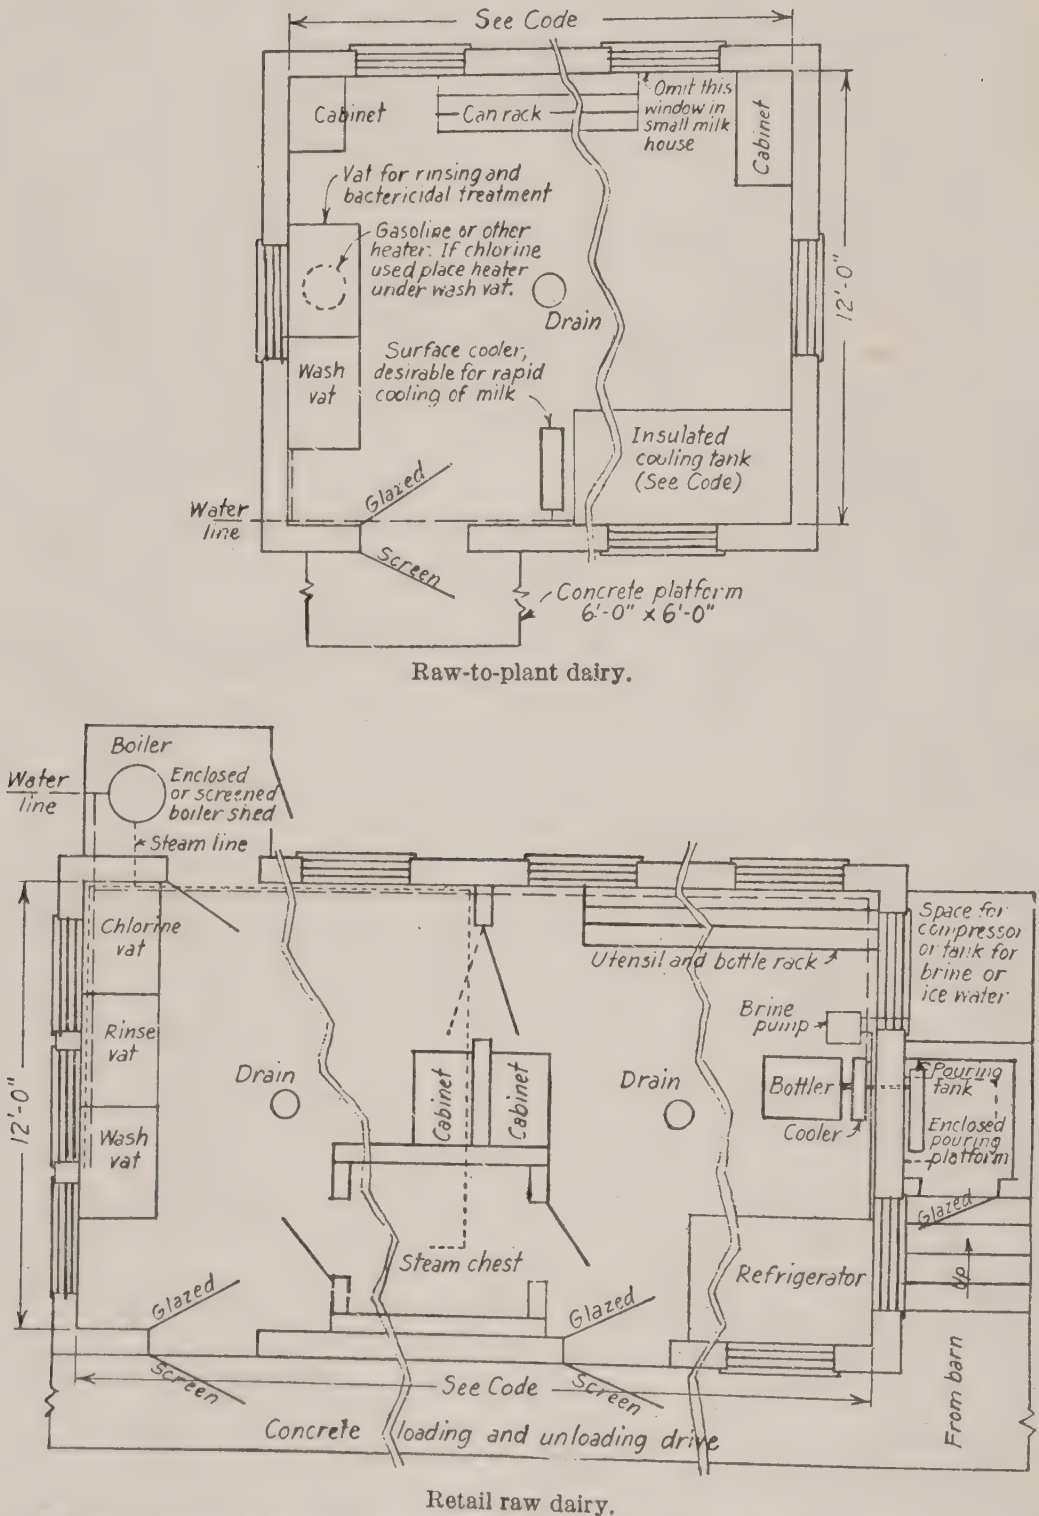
Suggested milk-house plans for raw-to-plant dairy and for retail raw dairy.
